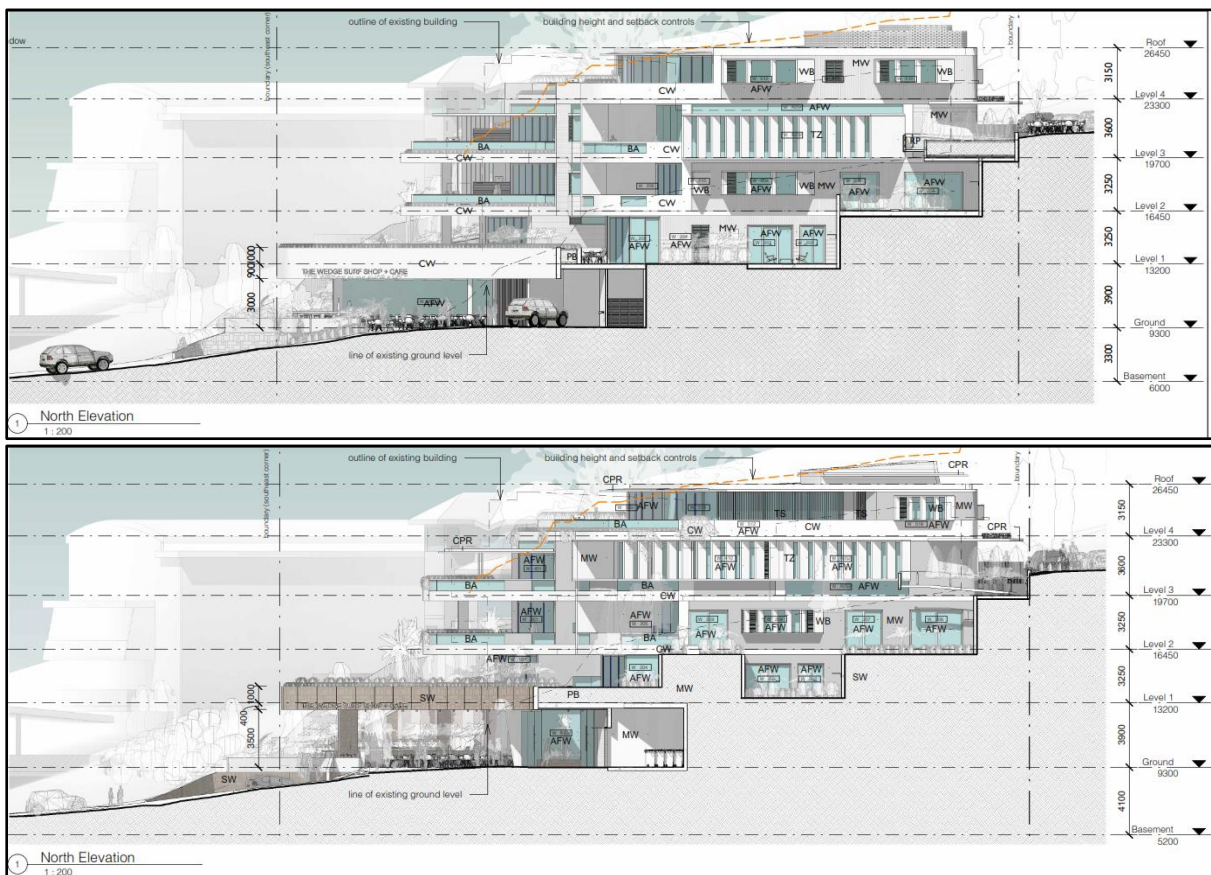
North Elevation - Original DA (top) and Review Proposal (bottom)
